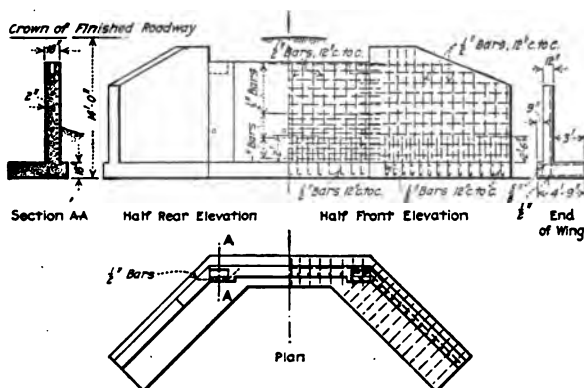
Type of abutment used for girder bridges by the Illinois Highway Commission. Wings of cantilever type. Main wall supported by wings as counterforts.
